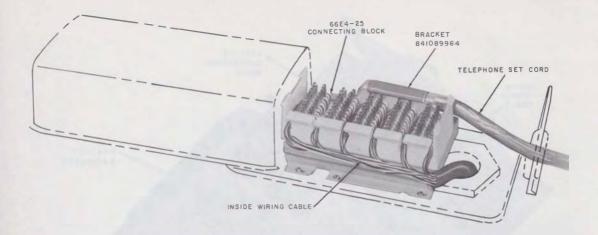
E4-25 Connecting Block Installed in Commercial Fitting
